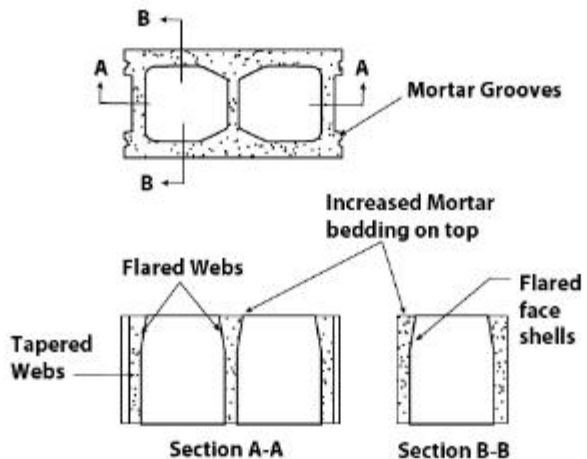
Typical Concrete Block Masonry Unit (Hollow Unit, with Flanged Ends)
